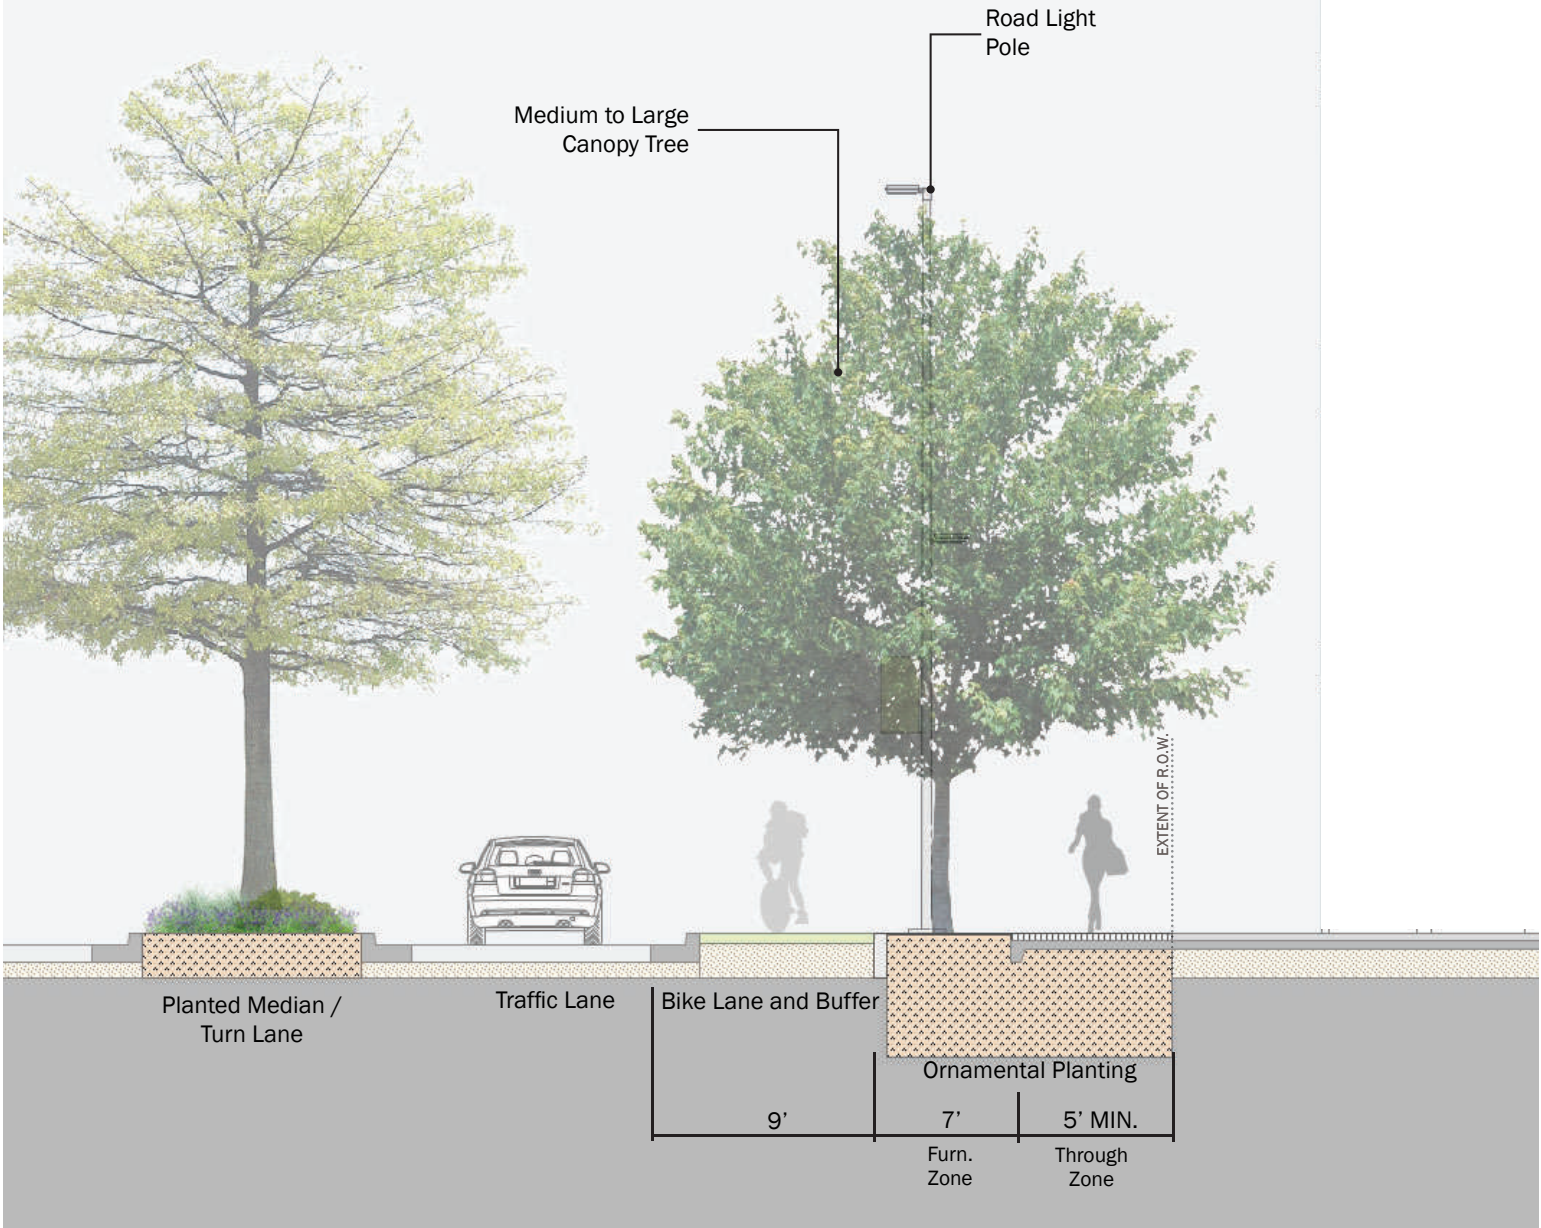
MAIN STREET & CAMPUS PARKWAY SECTION
